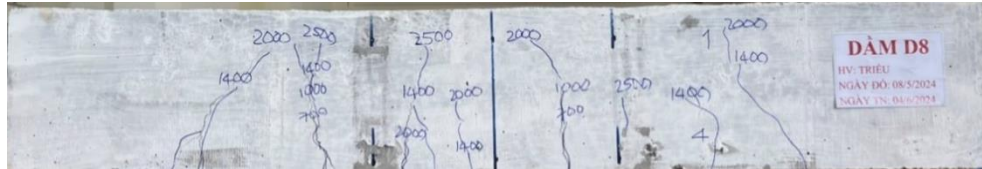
Cracks of D8 reinforced concrete beam
